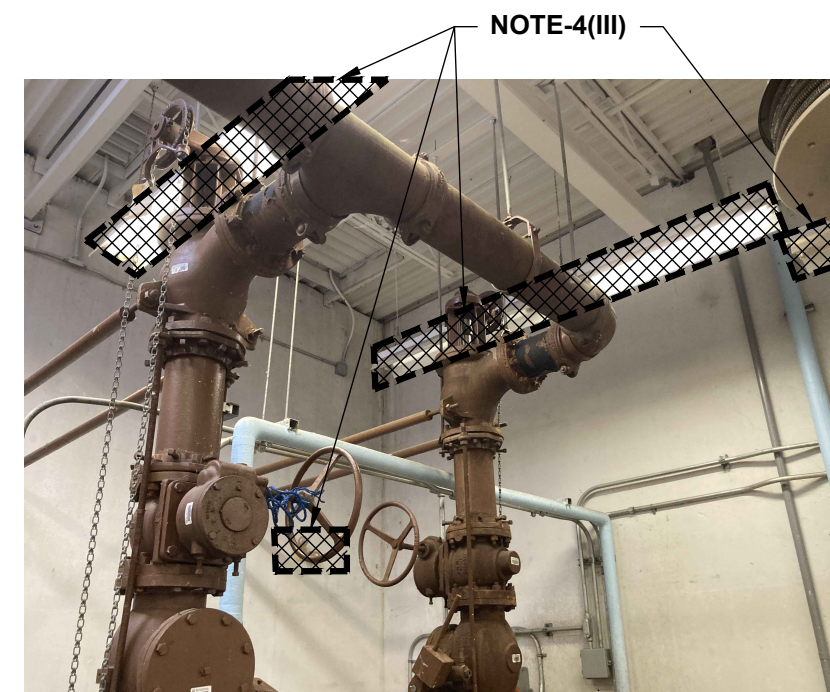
(3) - LIGHTING FIXTURE AND REMOTE HEAD PUMP ROOM
